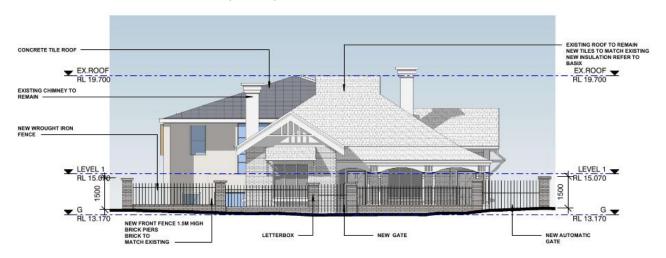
Street-frontage elevation of the existing dwelling and proposed addition (as originally submitted).
